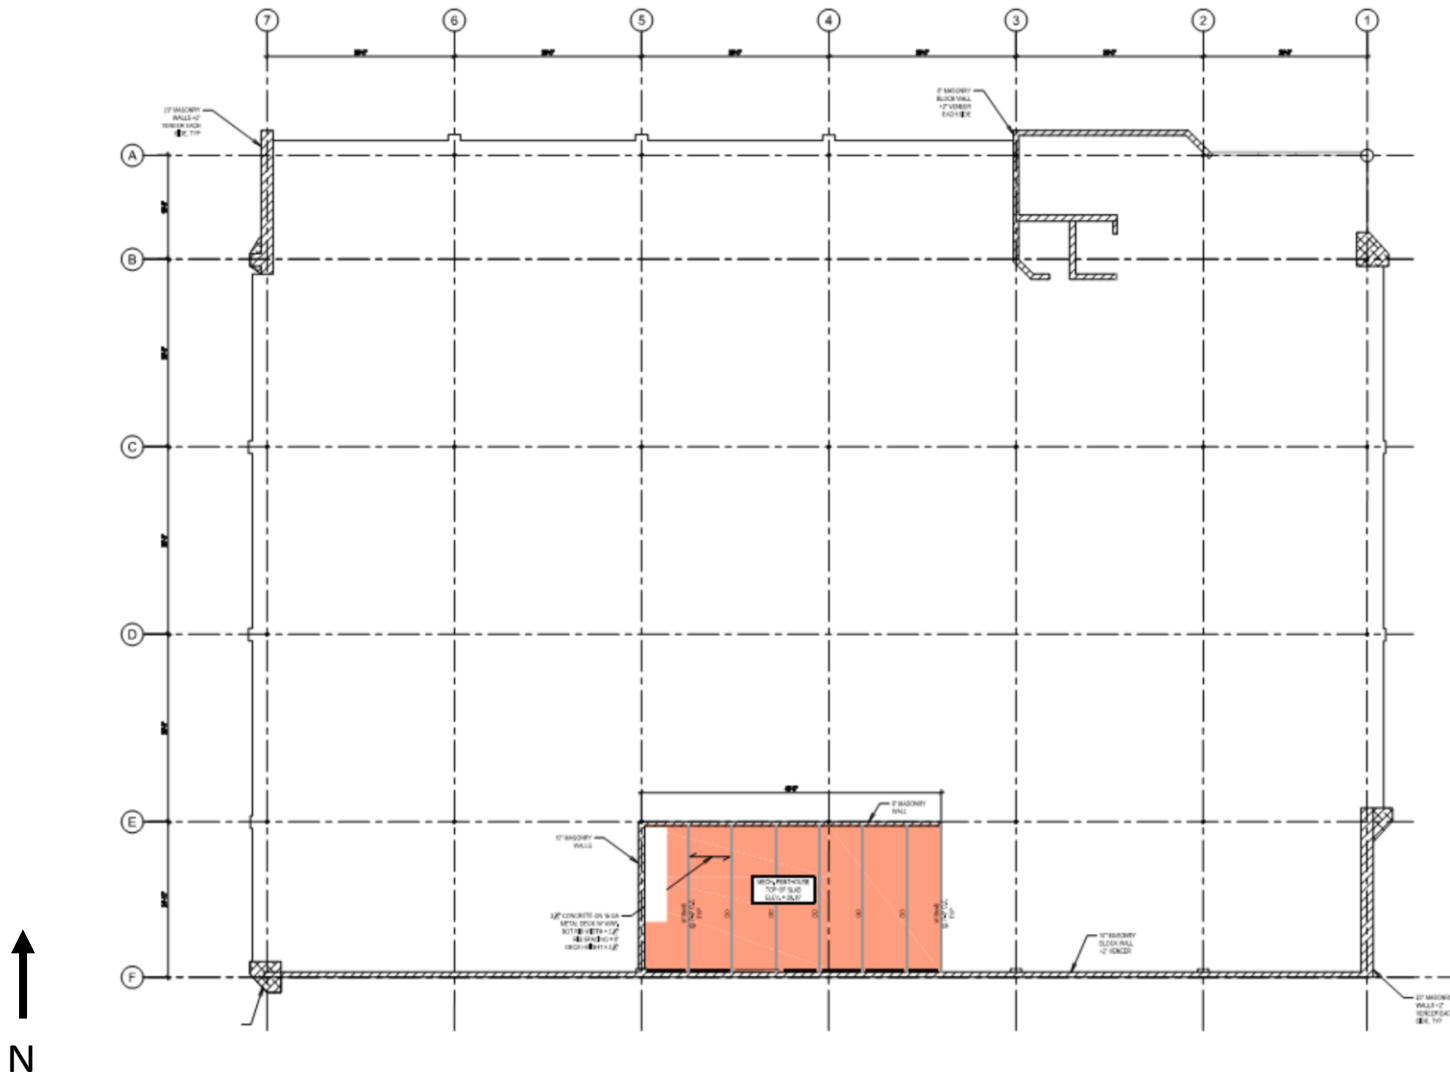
Mechanical Mezzanine Level Framing Plan
